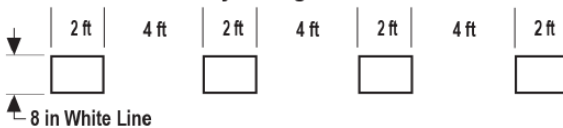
B - Lane Drop Markings at Conventional Highway Intersections
